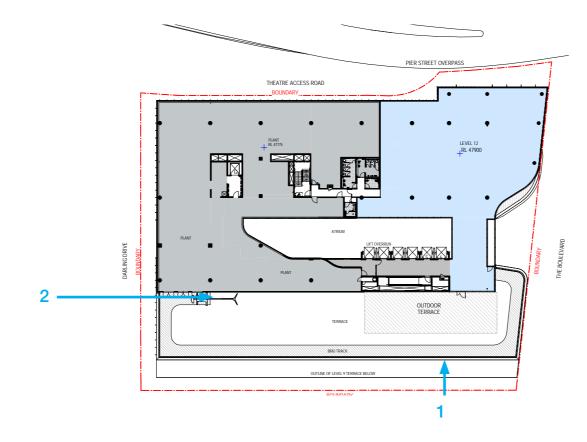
Section 96 NW Plot Proposed Level 12 Plan
